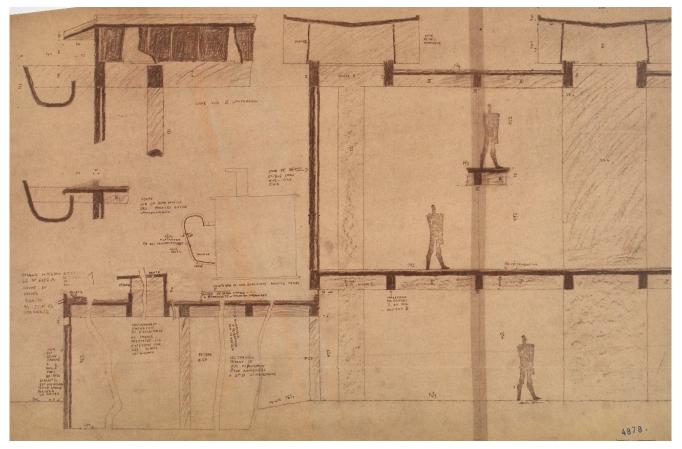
Archival drawing showing section through double brick wall with cavity. Source: FLC Archive
